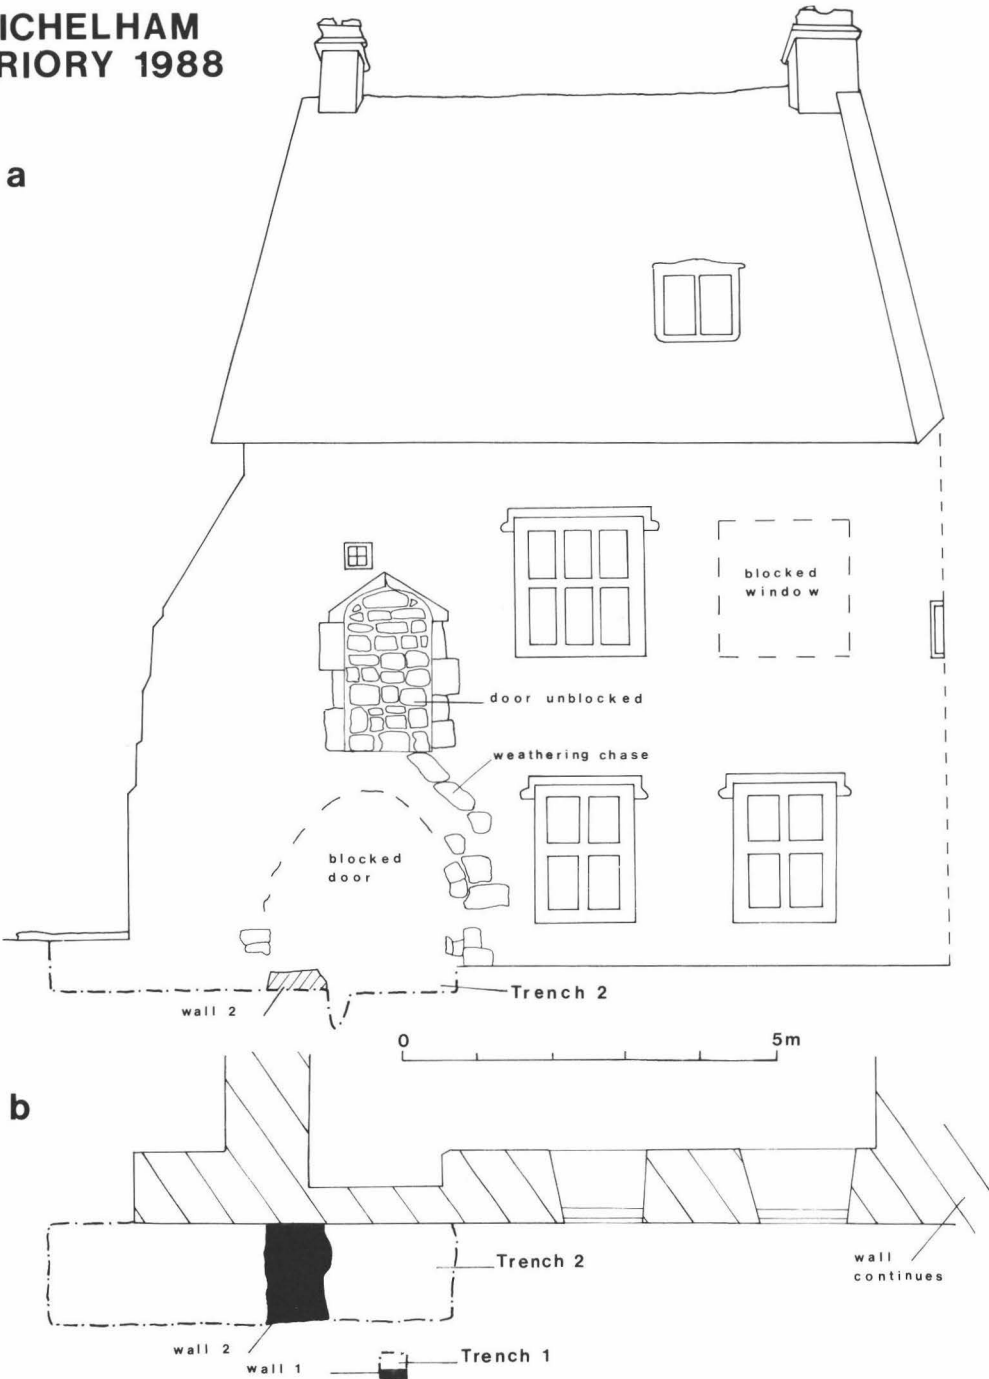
Michelham Priory 1988. a) elevation and b) plan of the west wall of the medieval western range showing the position of builder's trenches 1 and 2.
